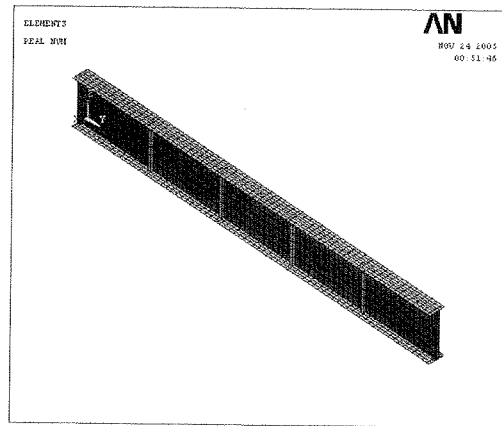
Finite Element Model for an I-shaped beam with vertical Stiffeners
